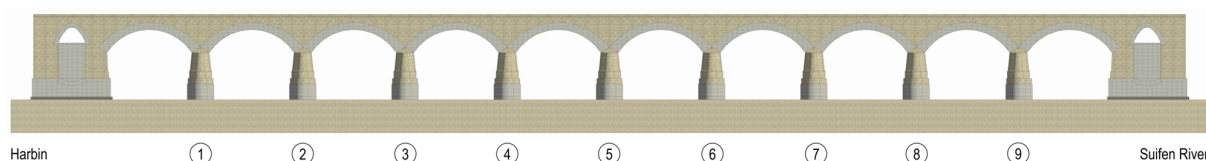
Reconstructed elevation of the bridge at completion, based on original design drawings.
